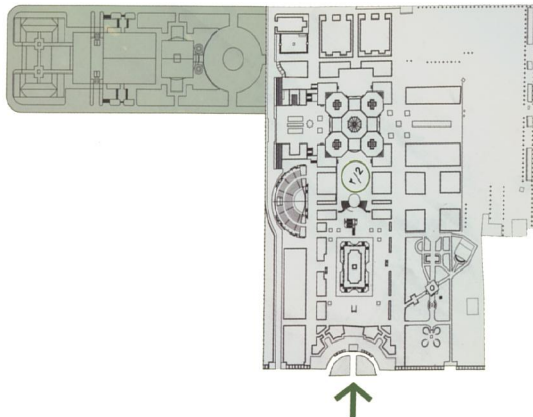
the schematic architectural plan of Khavaran Cultural Center (Javan)
